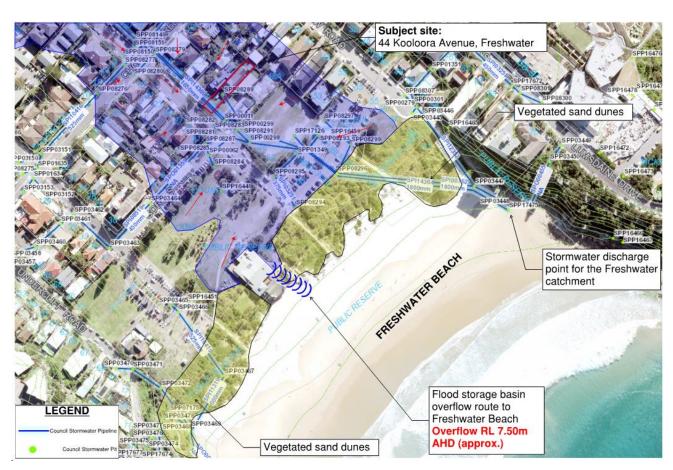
Subject Site Location and Surroundings. Source: SIX Maps (NSW)
